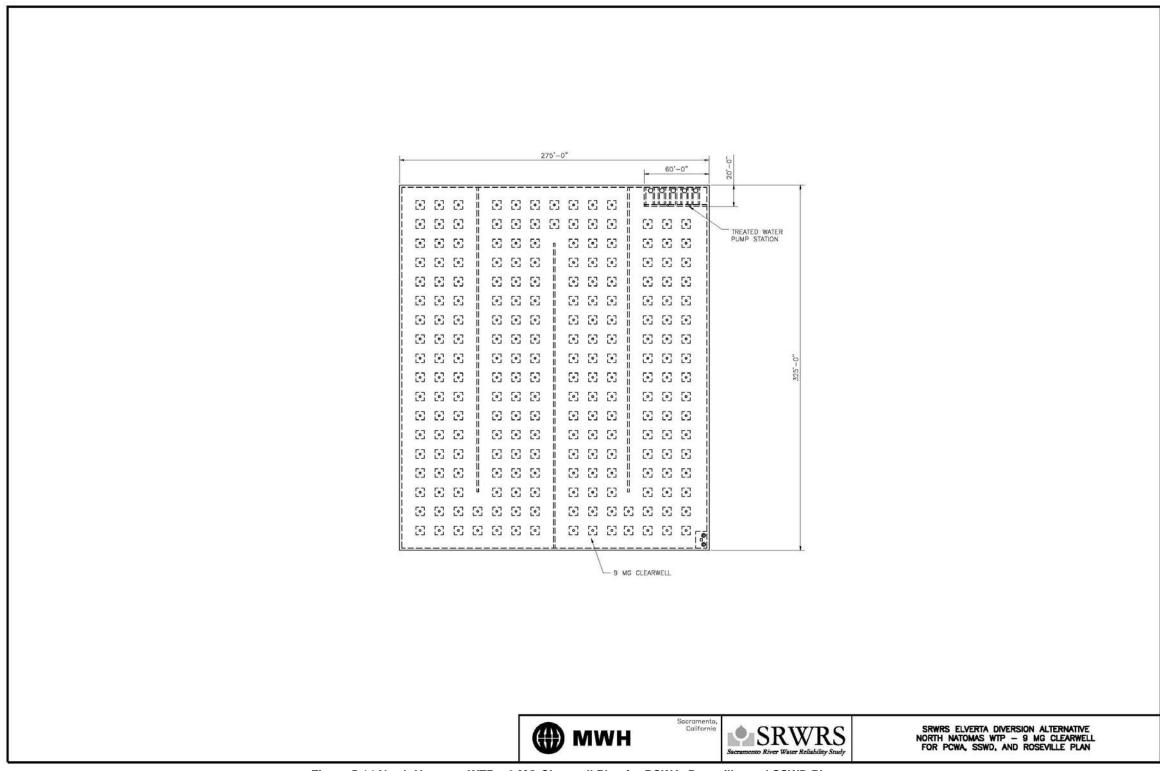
North Natomas WTP - 9 MG Clearwell Plan for PCWA, Roseville, and SSWD Plan
